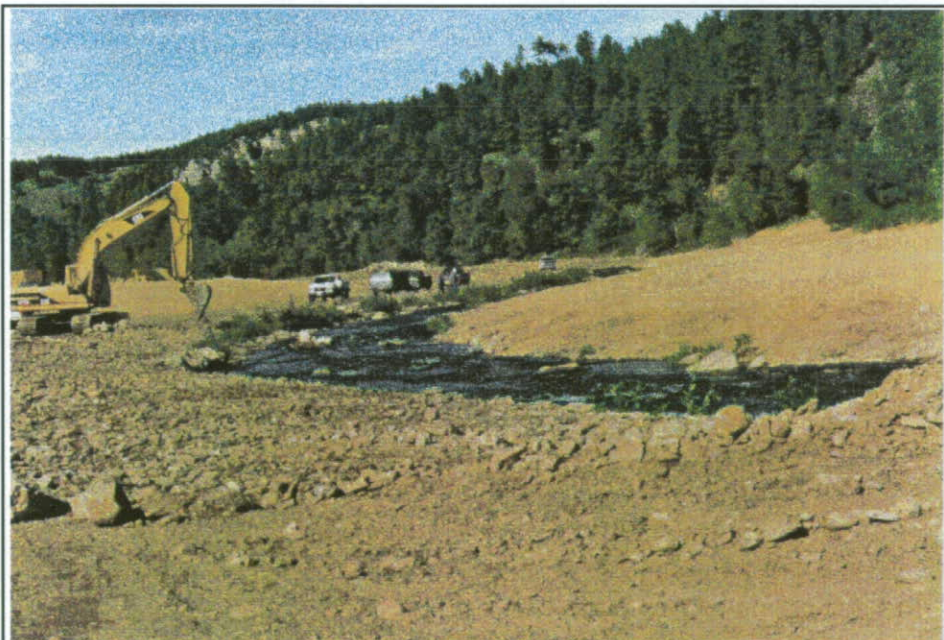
Homestake crew putting finishing touches on reclaimed Dakota Placer mine site.
